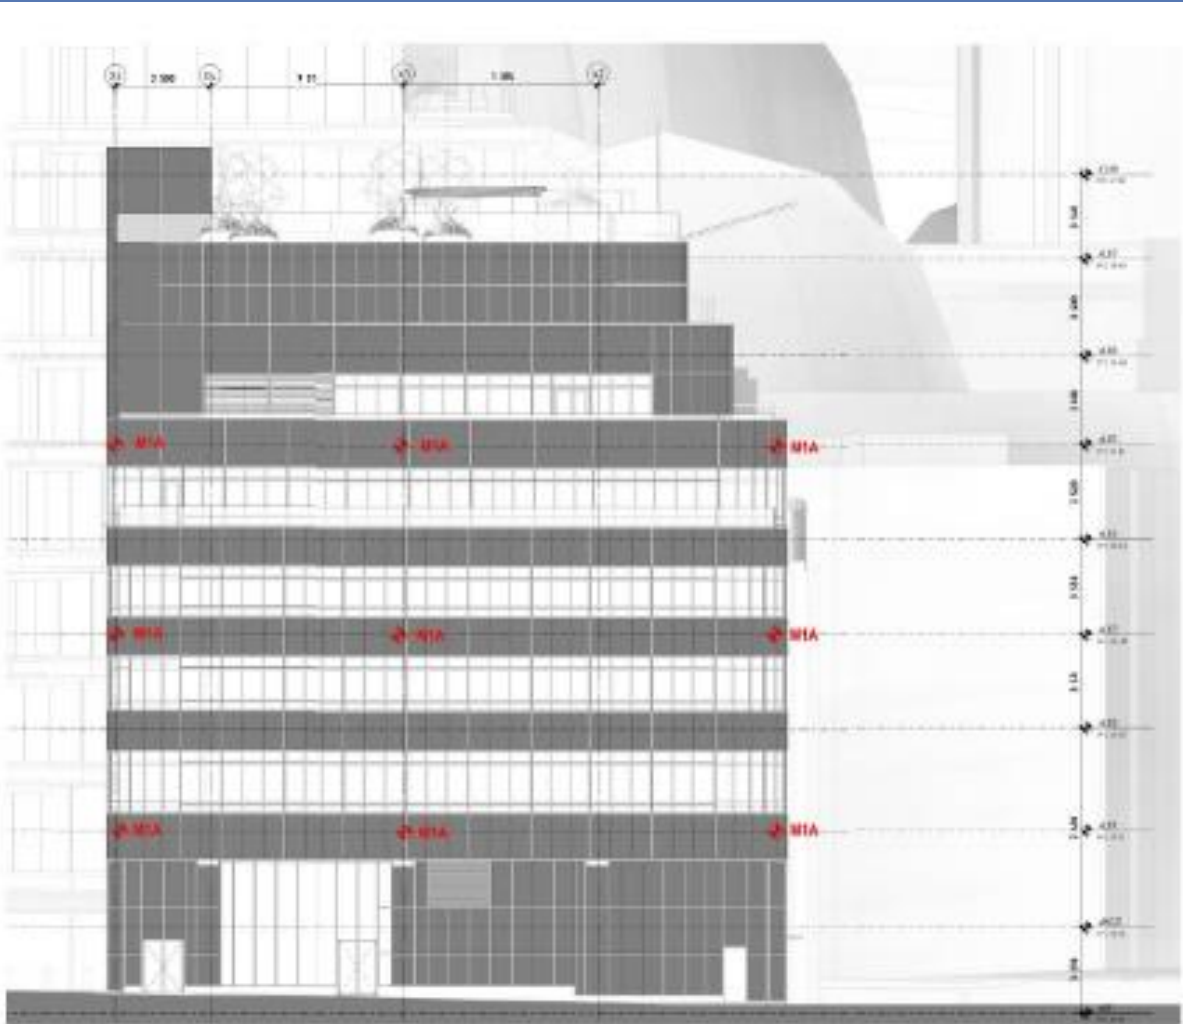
WEST ELEVATION PROPOSED MONITORING ARRANGEMENT FOR DEB FACADE
